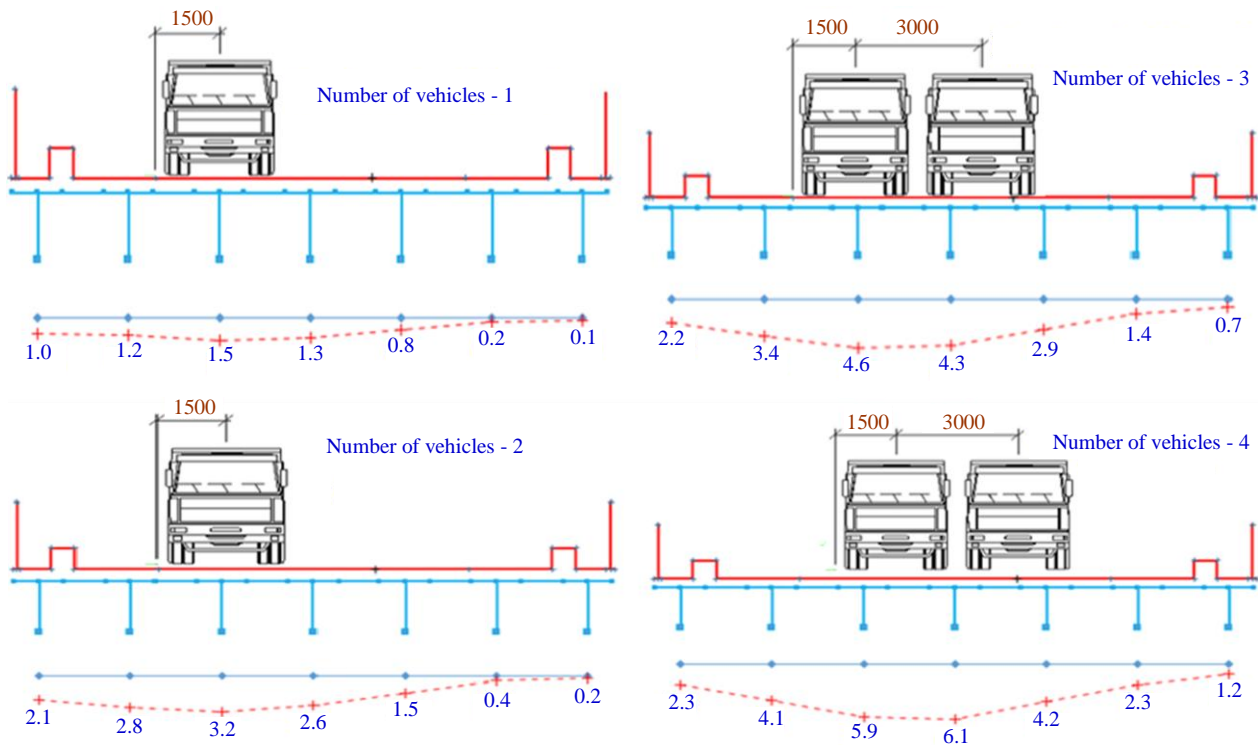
Experimental deflections at the mid-span of the beam under the first loading scheme (values in mm).
